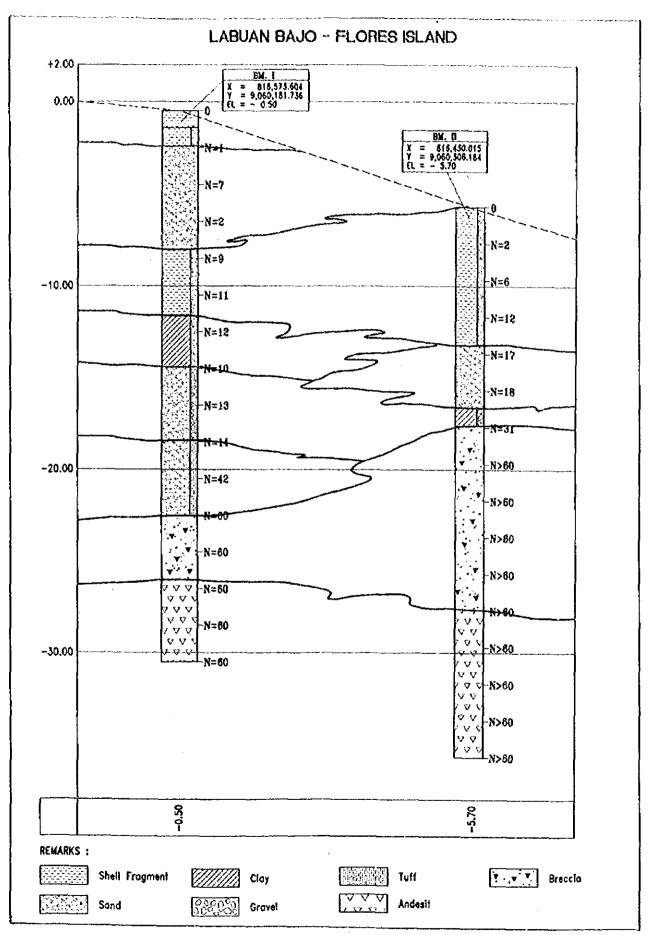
Soil Profile of Labuhan Bajo Site
